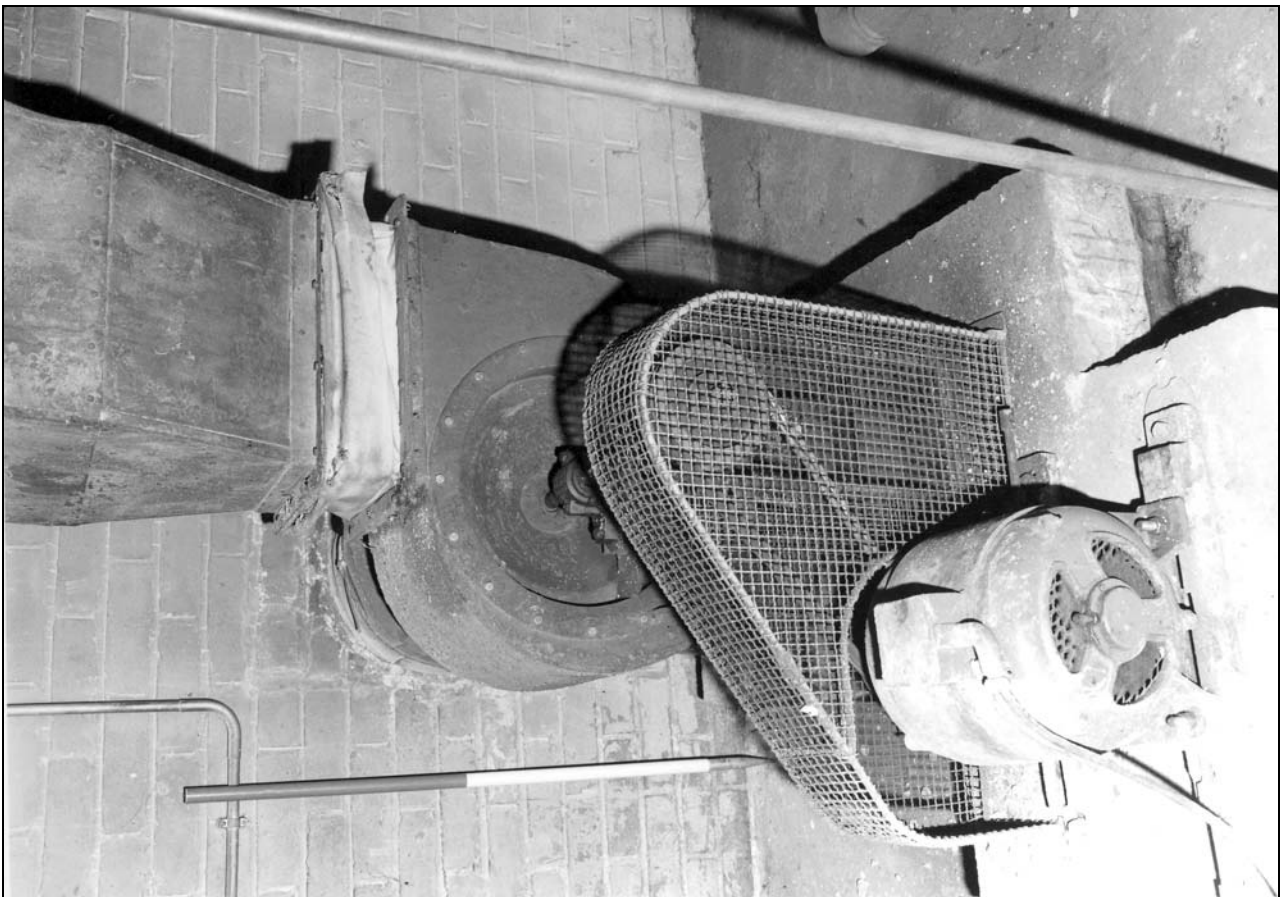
Basement: electrical motor and fan serving warm air ducts (film 1, frame 6)
